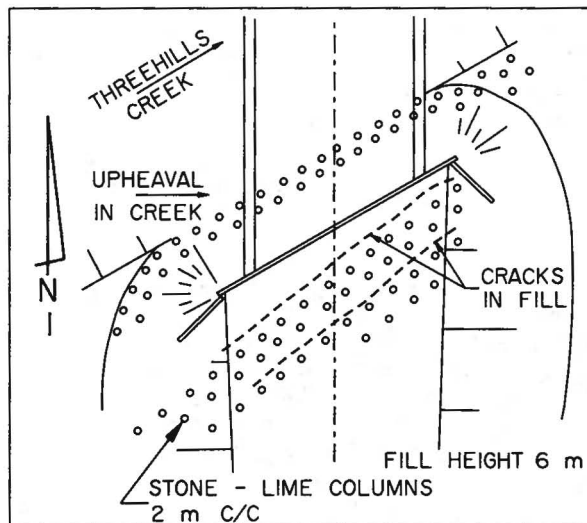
Showing Layout of Stone-Lime Columns in Headslope
